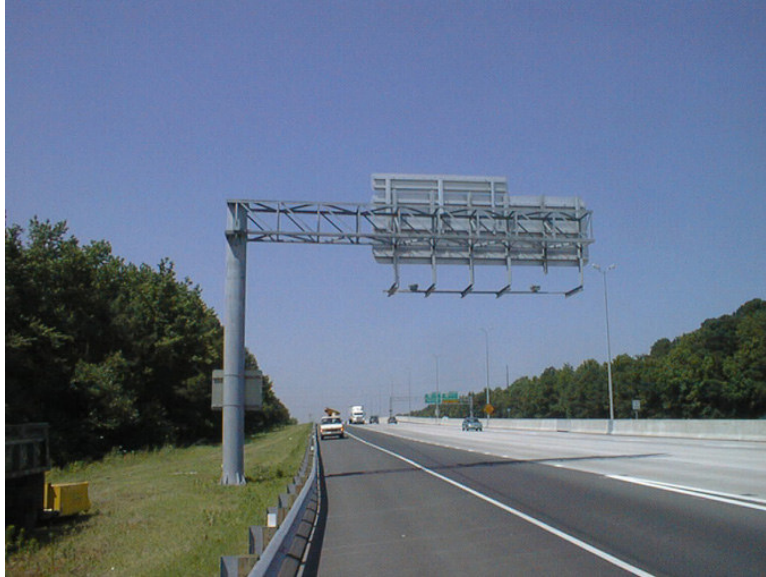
Rear View of a Four-Chord Cantilever Sign Structure
